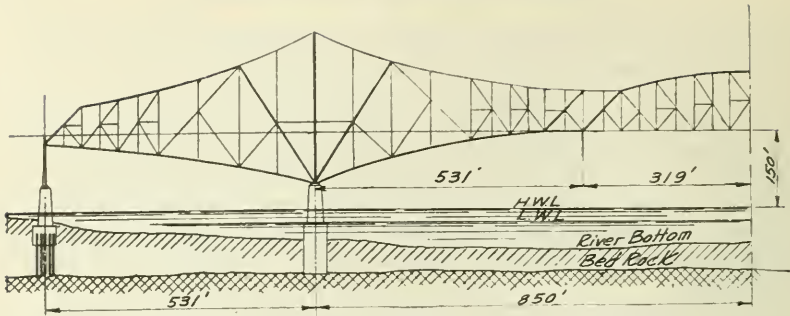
Layout for 1,700-foot Span Cantilever Railway Bridge.
